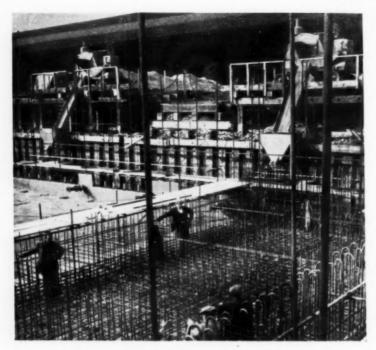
Construction at Gravesend to Height of 12 ft. 6 in.
